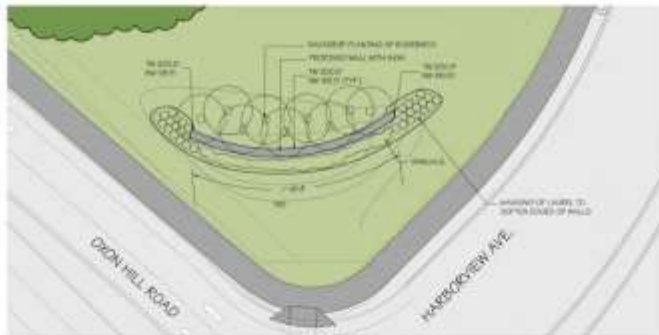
DETAILED SITE PLAN SET (PAGE 9 OF 10)
